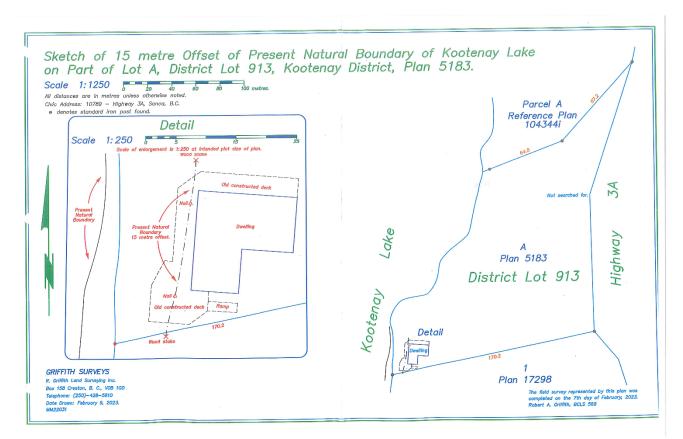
Sketch Plan showing the 15 metre floodplain setback and the location of the existing dwelling and deck. See Attachment 'B' for a full size version of this sketch plan.
